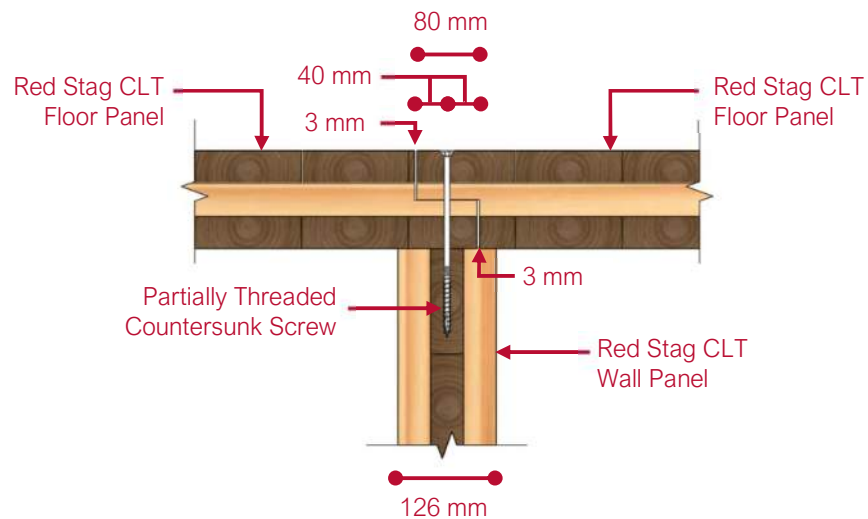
Red Stag three (3) Layer CLT wall panel to CLT floor panel half joint connection.
